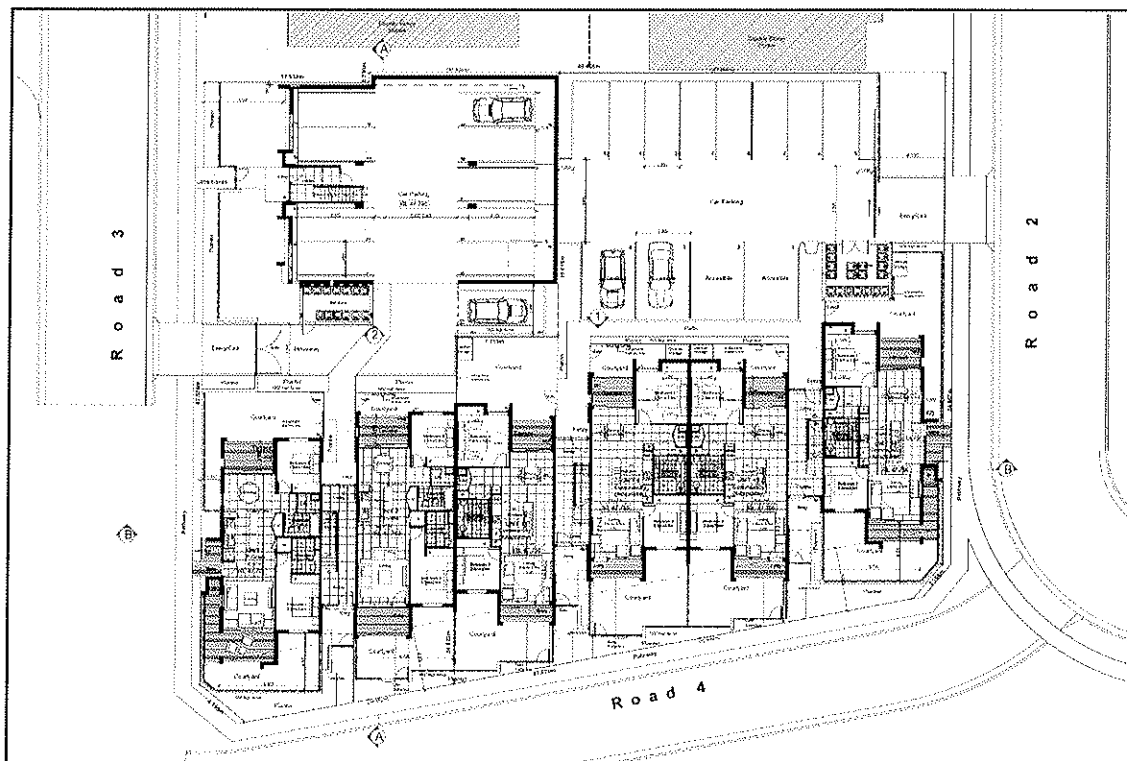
Ground floor layout of walk-up flat building (Source: Urbis)
